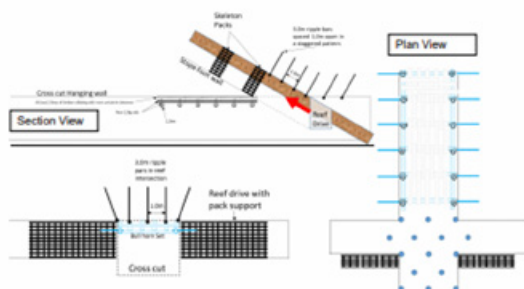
Proposed layout of bullhorn sets at the reef intersection
